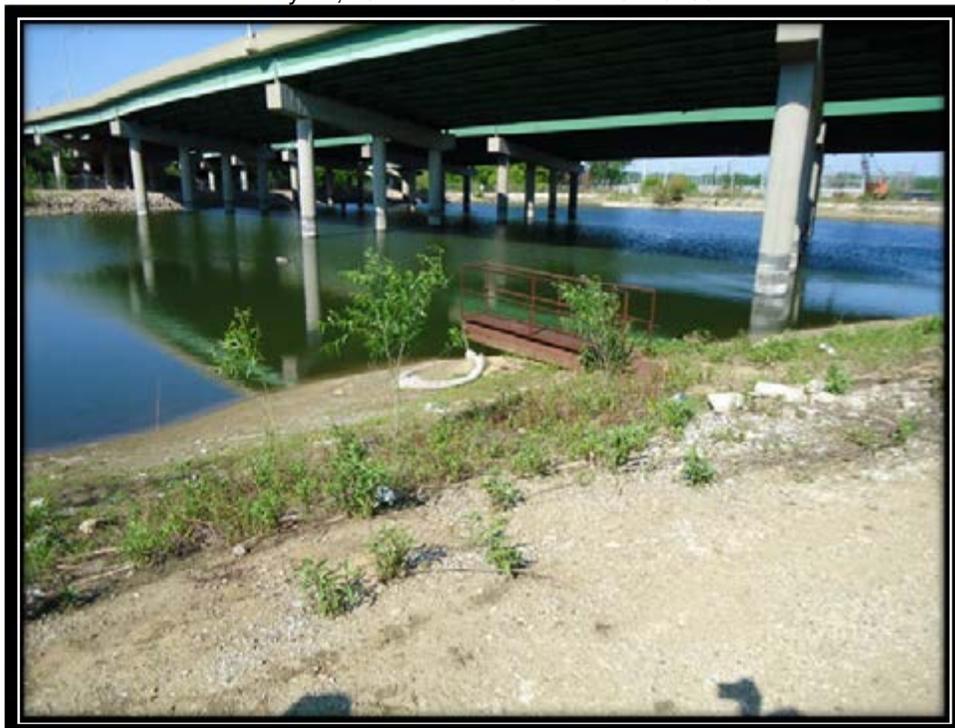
Ash Pond 4 Inlet Pipe from Pond 3 (note pipe rusted through)
